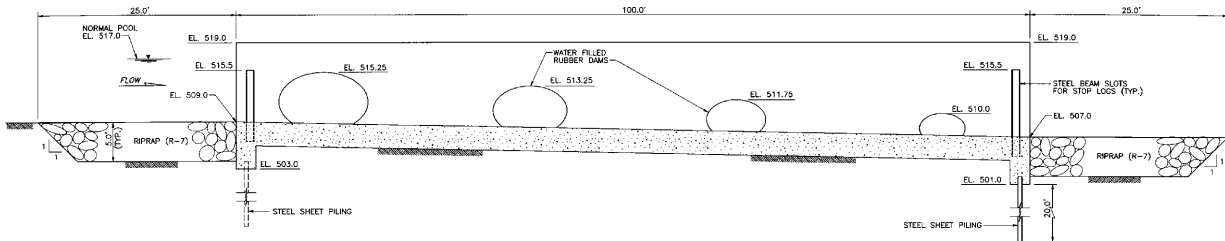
Profile of proposed fish passage facility using Bridgestone water-filled rubber bodies.
